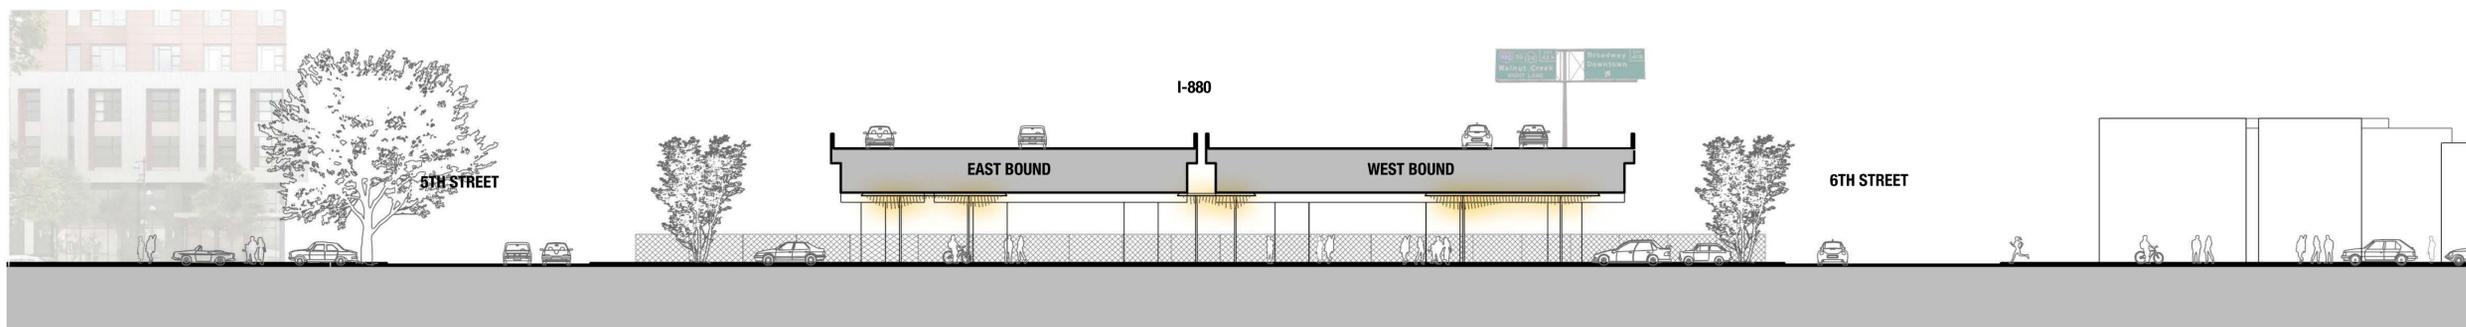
Madison Street Underpass: view from 6th Street, looking south
